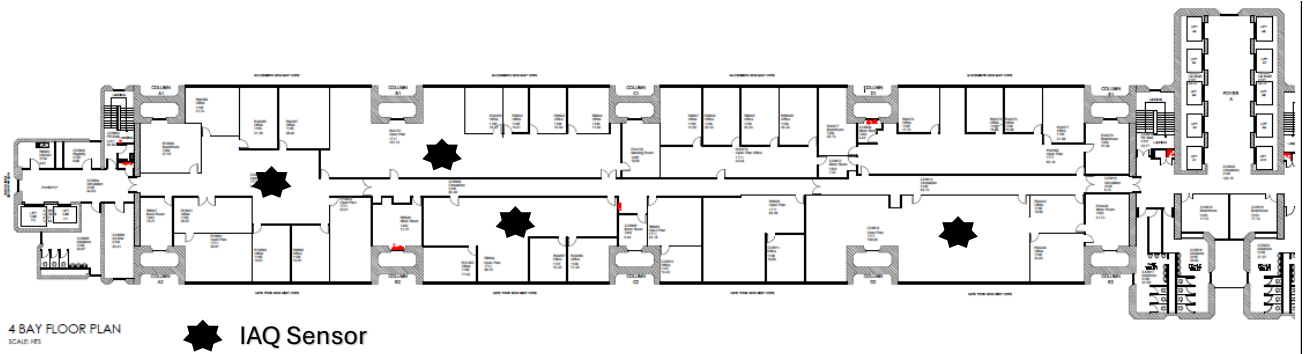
Tower Building proposed sensor positioning 20th floor (6).
